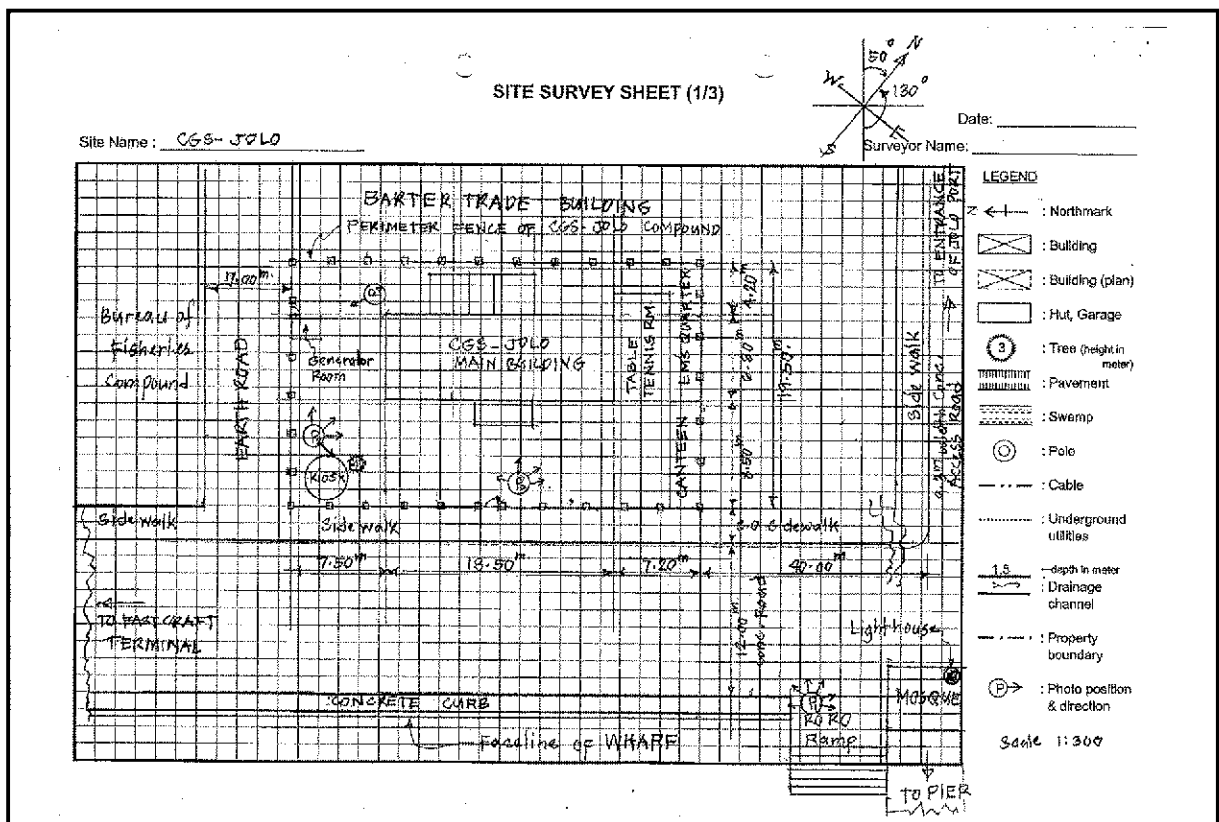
SITE LAYOUT FOR CGS JOLO
